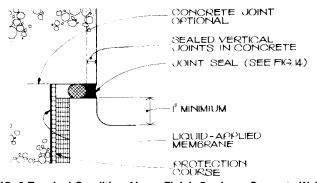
Terminal Condition Above Finish Grade on Concrete Wall (see 7.3.1)
